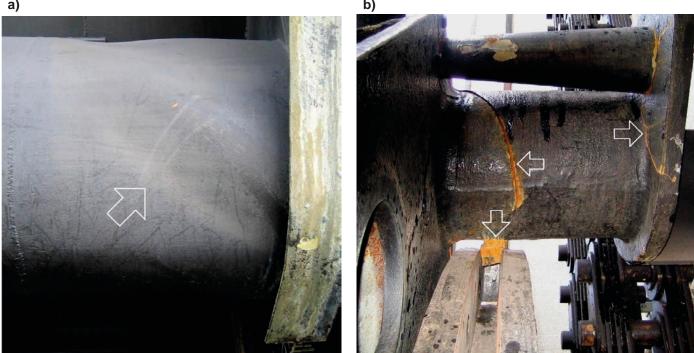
Lith Weir gate damages, details, photos Rijkswaterstaat a) deformed torque tube of the flap section, b) fractures of flap lever arm castings
